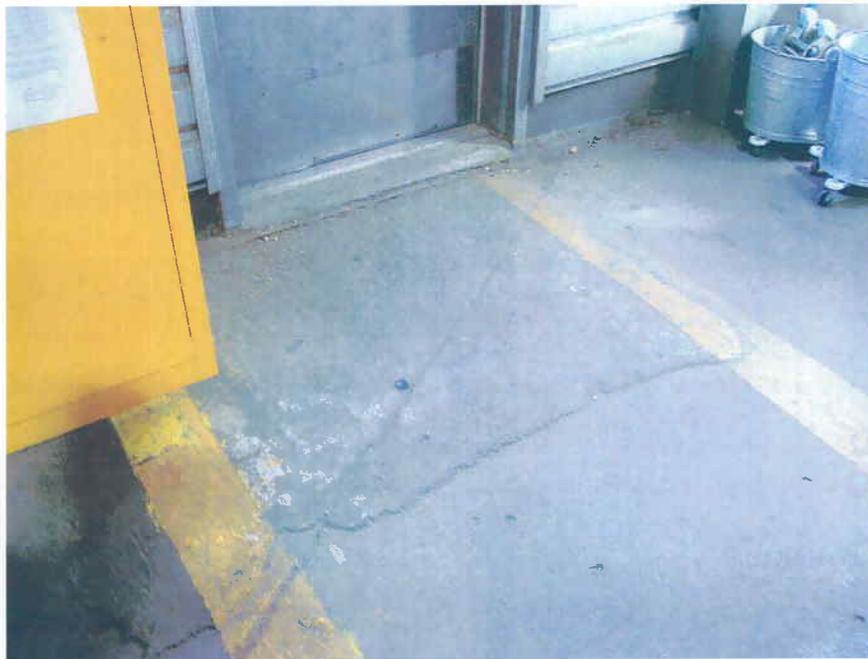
Concrete ramp at exterior doors - Hangars 2 & 3.
